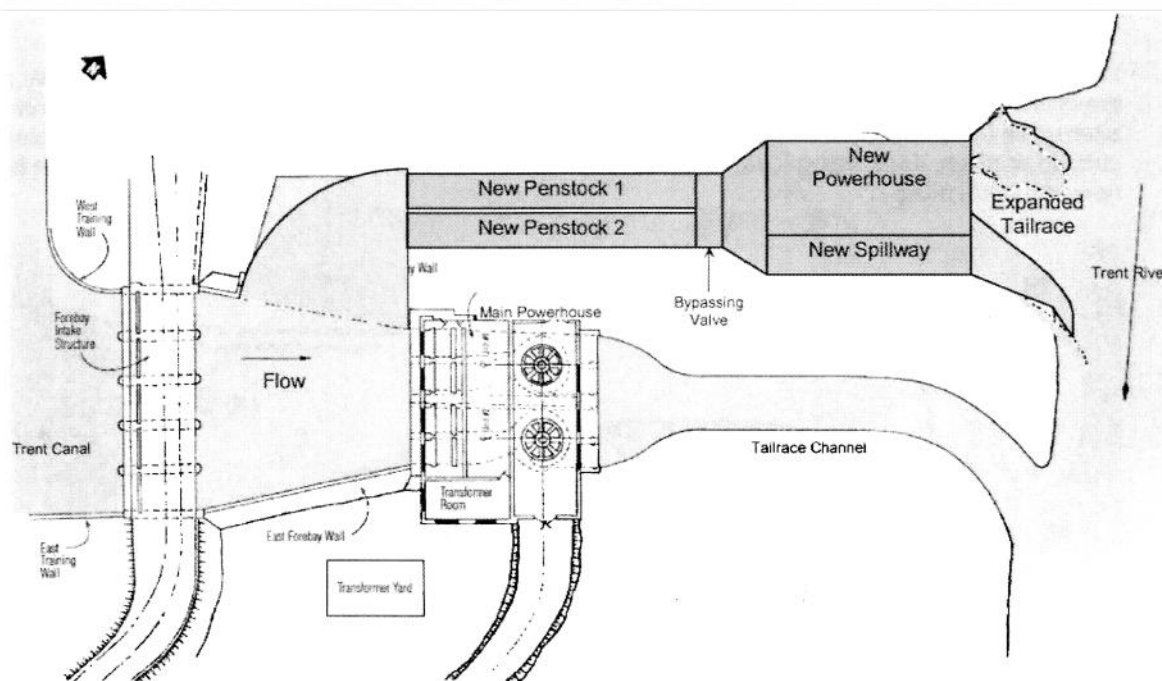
Ranney Falls G3 Proposal with penstocks and short tailrace
